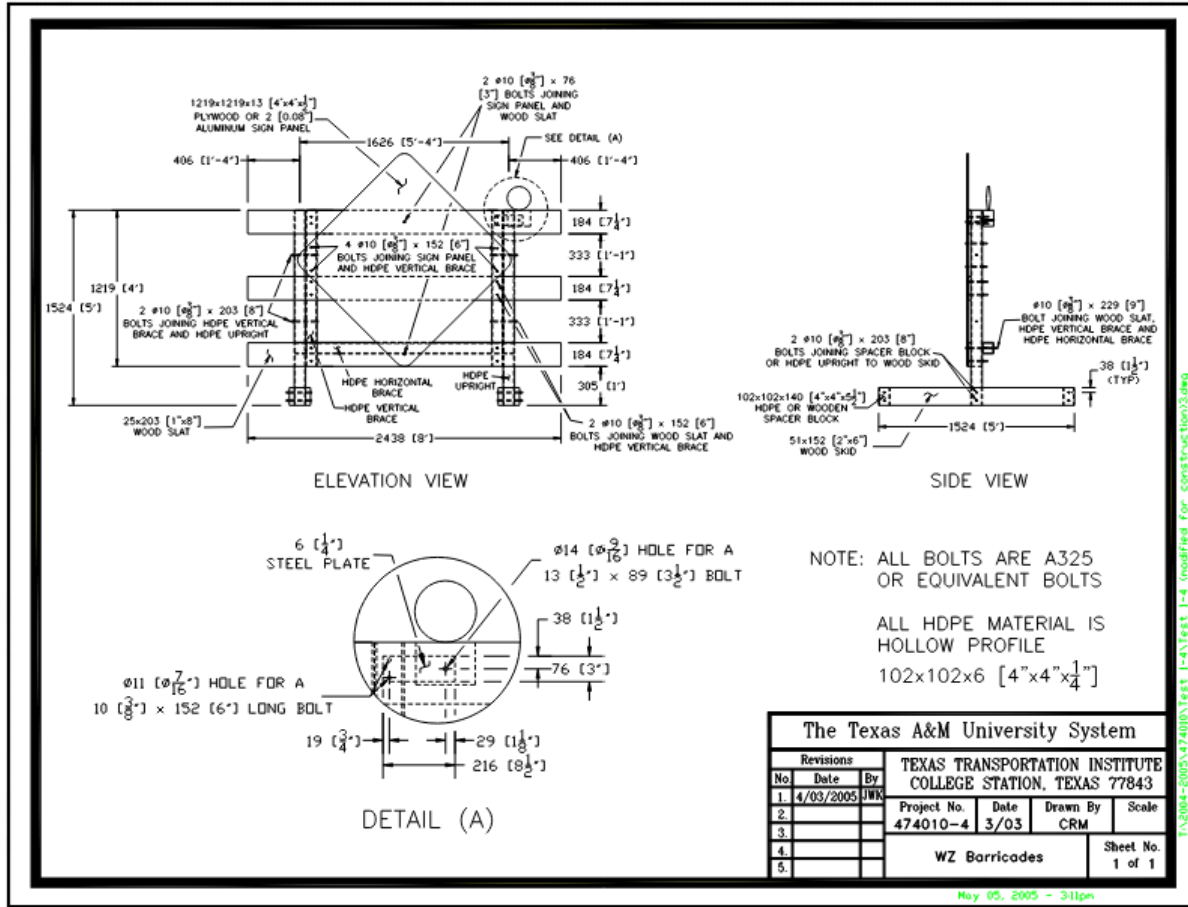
Modification Details of HPPL Type III Barricade with 1.2 m x 1.2 m (4 ft x 4 ft) sign panel
